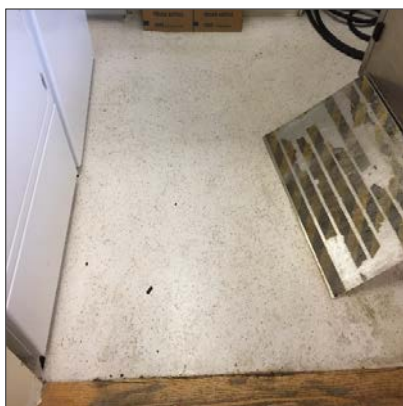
Non-asbestos vinyl sheet flooring, stone, white, blue and brown pattern, Level 1 Easy Street Area, East Wing.
